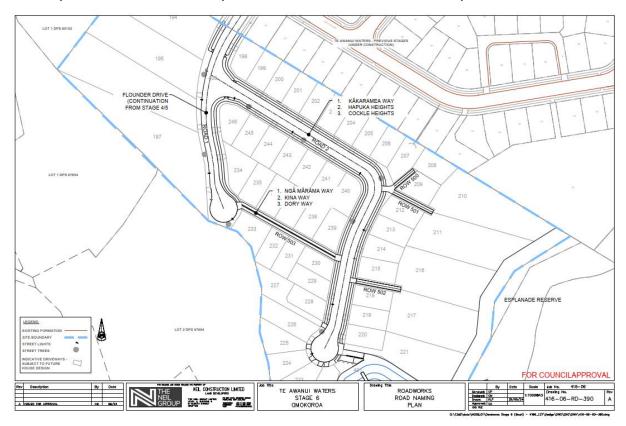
Road Naming Plan – Prepared by The Neil Group
